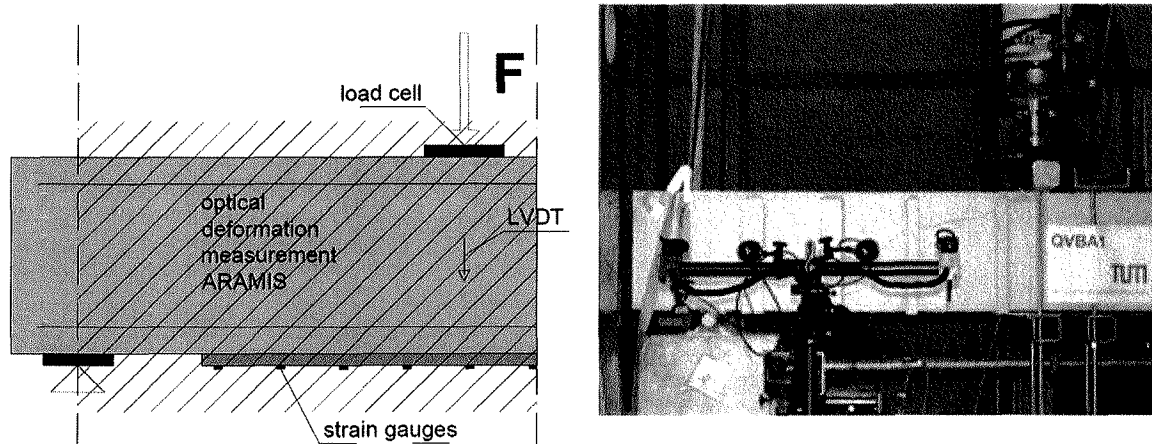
Test set-up for the shear tests (left) and measurement apparatus (right)
